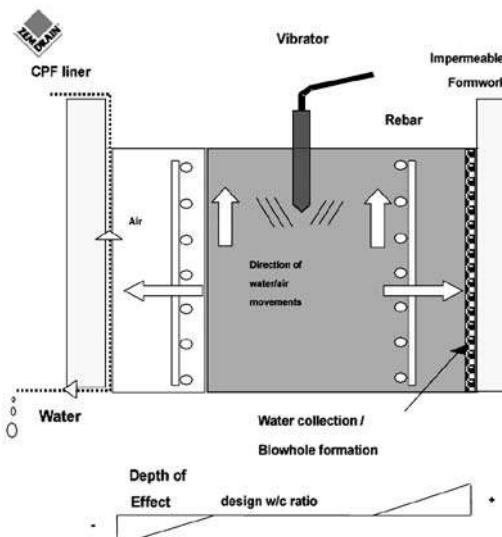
How CPF Liners Help in Improving Cover Concrete
